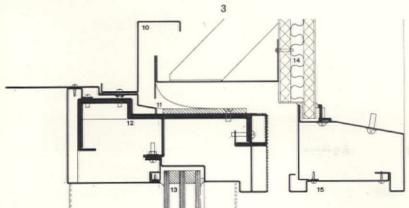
Detail A of the revolving wall and restaurant ceiling 10 aluminium flashing
